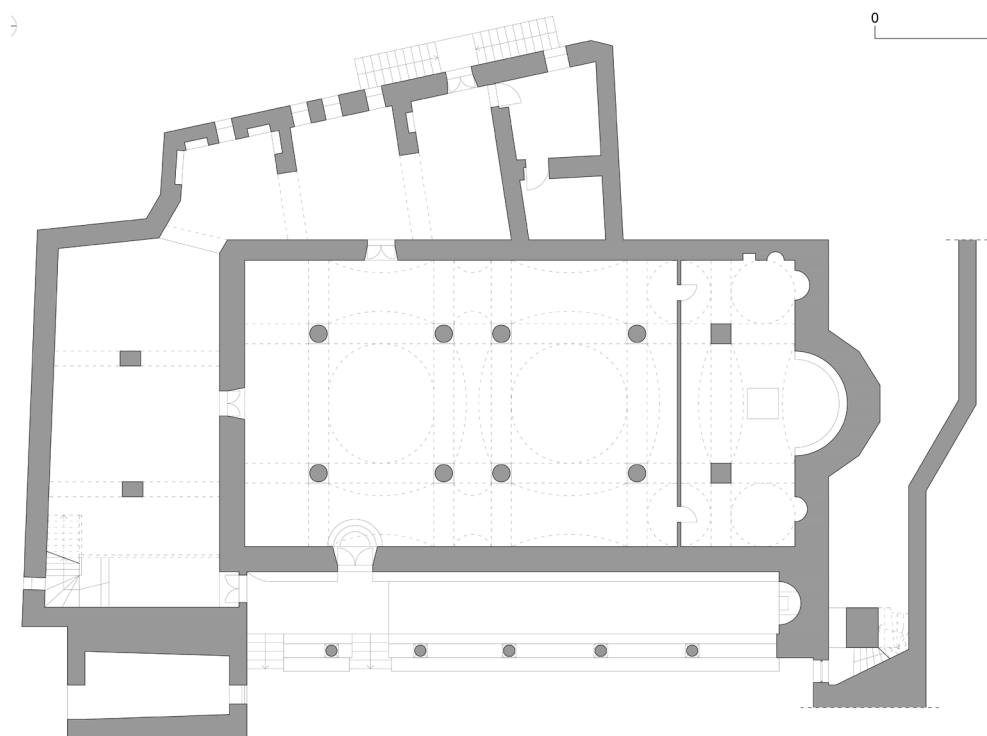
Albania, Berat, Onufri Museum, ground floor plan
